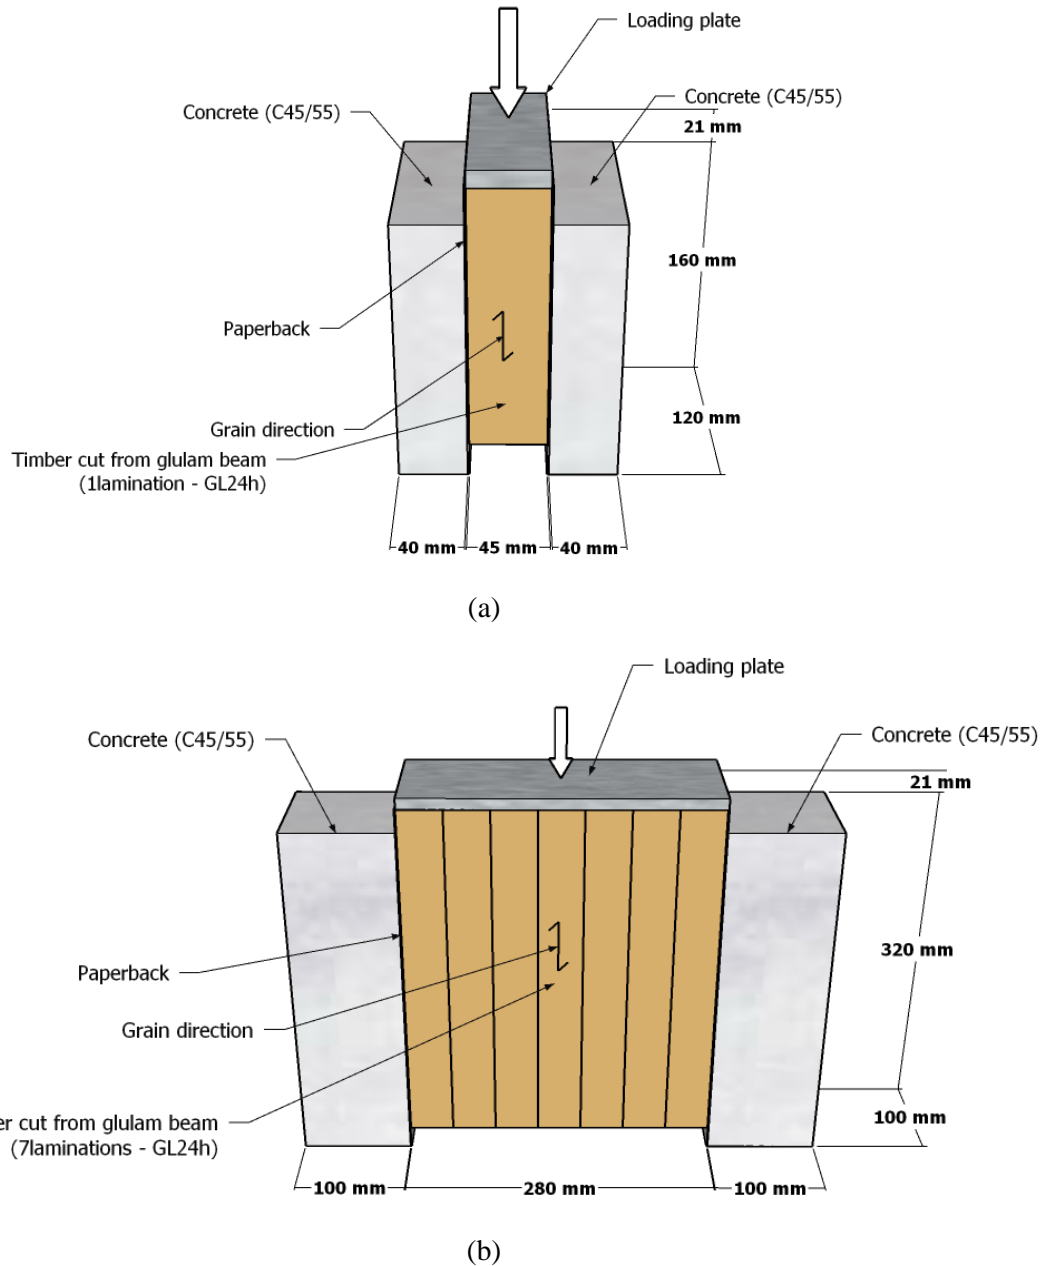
Shear test configuration and TCC specimen's basic features, (a) standard specimen, and (b) 3X bonding length specimen
